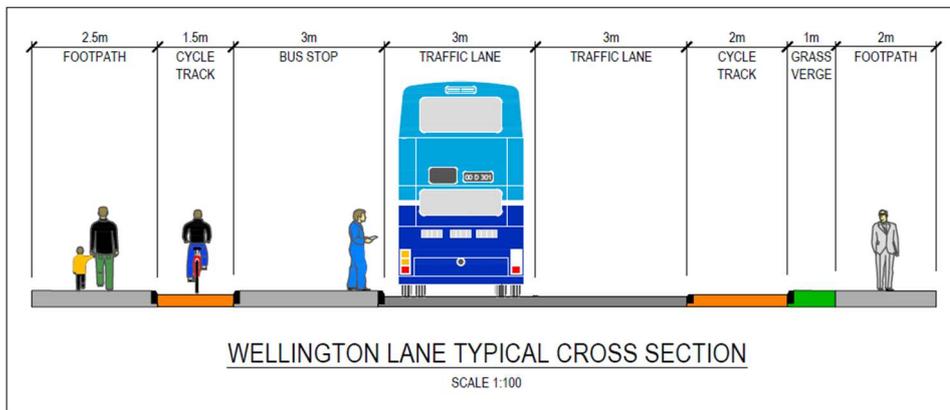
Typical cross sections (not to scale) (Source: DBFL)
